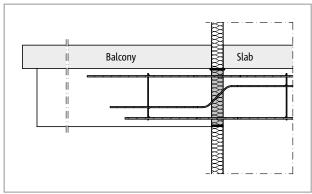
Schöck Isokorb® T type B: Balcony structure with freely cantilevered downstand beams (precast balcony)
